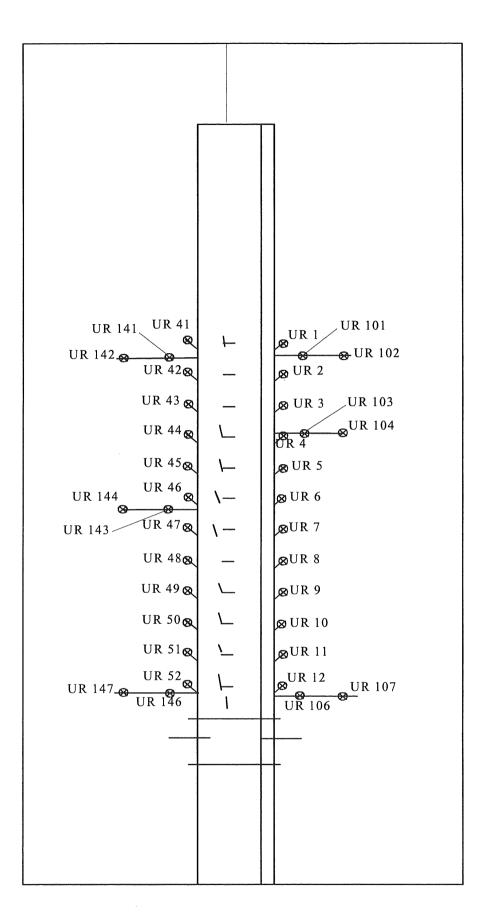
Position of measuring points in the boreholes of the rock in the floor (left part) and the roof. Vertical section.
